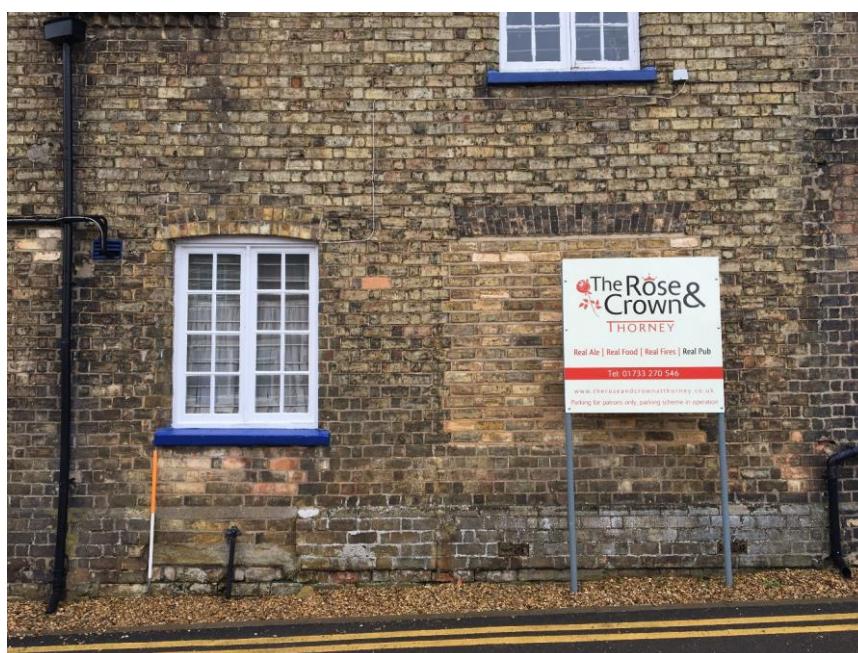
View E showing blocked window to right of segmental-arched glazed casement window in W-facing elevation
